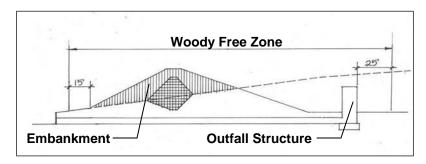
Woody Plant Restriction Area at Code 378 SWM Embankment
